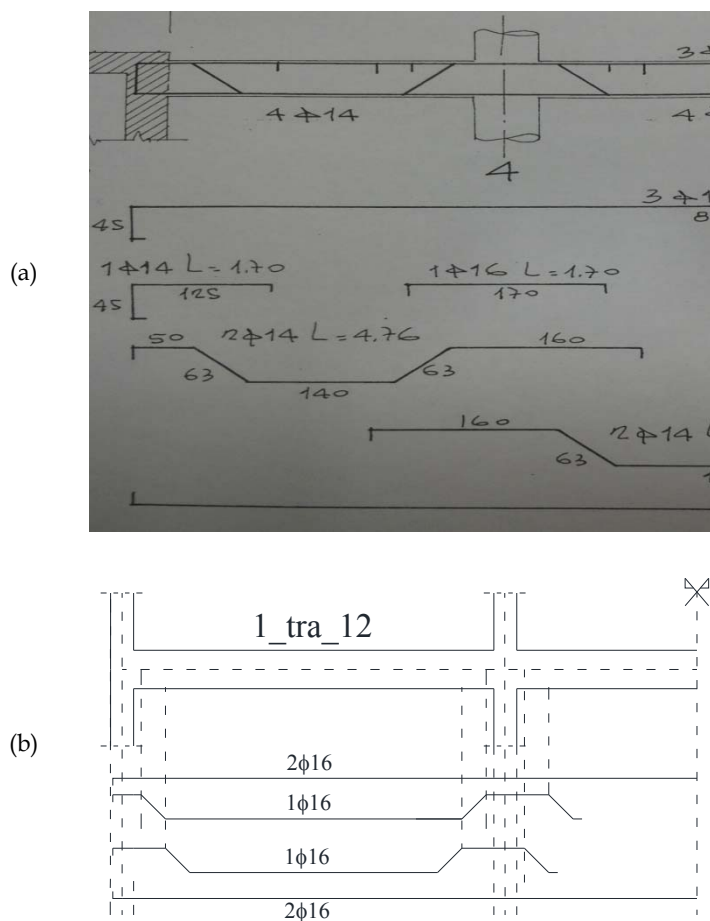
Longitudinal reinforcements of typical RC existing buildings: (a) original design scheme; (b) derived with the simulated design.
